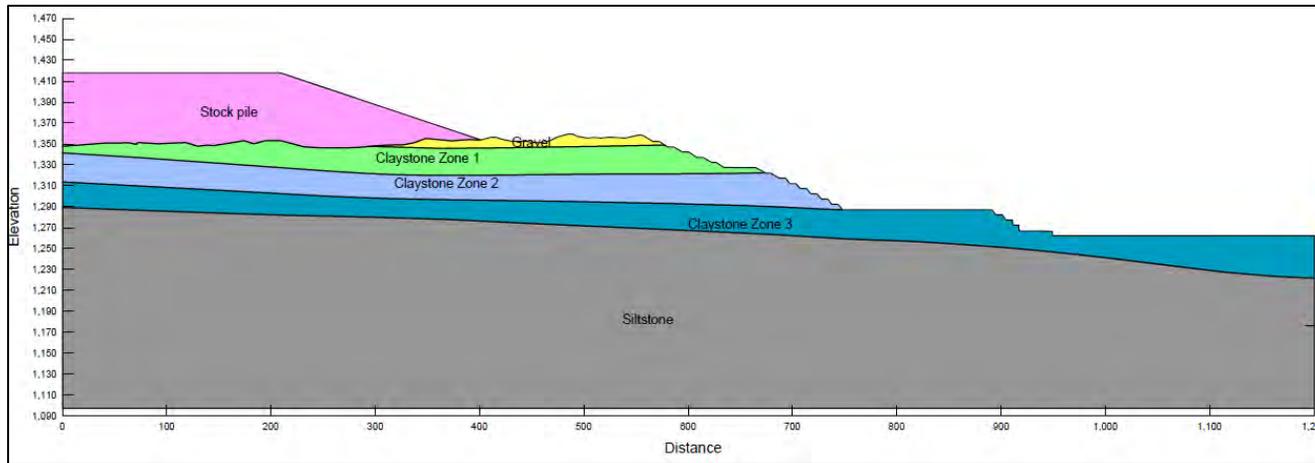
General Pit Stability Cross Section A (Source: GRE, 2023)
